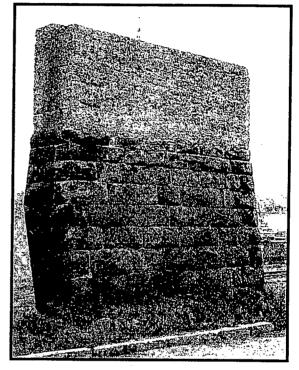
Bridge Pier Along Rail Line, South of Prince Street
